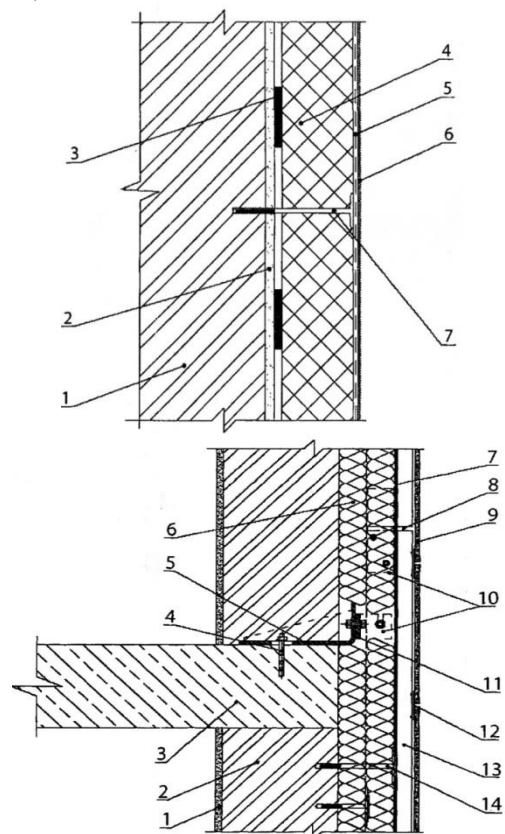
Constructive systems of external walls with façade thermal insulation: a – finished with light thin-layer plasters; 1 - load-bearing wall; 2 - plaster layer; 3 - adhesive coating; 4 - insulant; 5 - protective layer reinforced with fiberglass; 6 - finishing cover; 7 - element of mechanical fastening of the insulation; b - with ventilated air layer and riser fastening of external equipment with industrial elements; 1 - internal plaster; 2 - half-timbered or load-bearing wall; 3 - floor slab; 4 - wedge anchor; 5 - bracket; 6 - insulant; 7 - airtight film; 8 - air ventilated layer; 9 - industrial facing elements (ceramic tiles); 10 - connecting elements; 11 - gasket; 12 - stapler; 13 - riser; 14 - element of mechanical insulation fastening.
